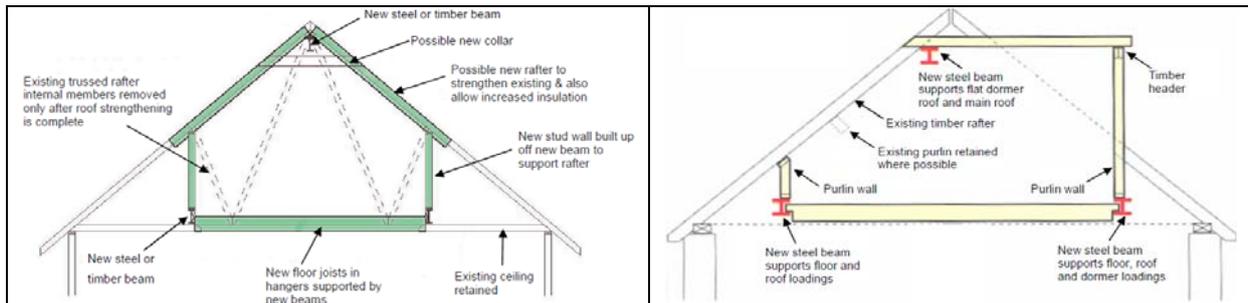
Typical structural modifications of Trussed rafters for habitable roof
